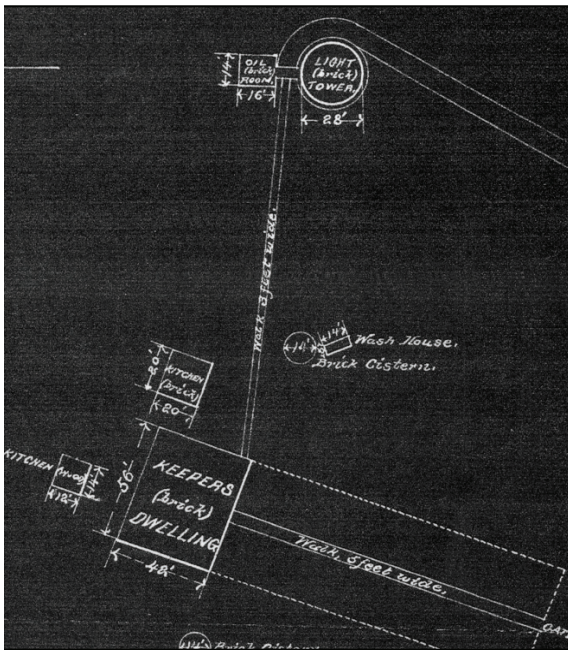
Close-up of 1887 small-scale plan of Light Station showing existing walkways.
